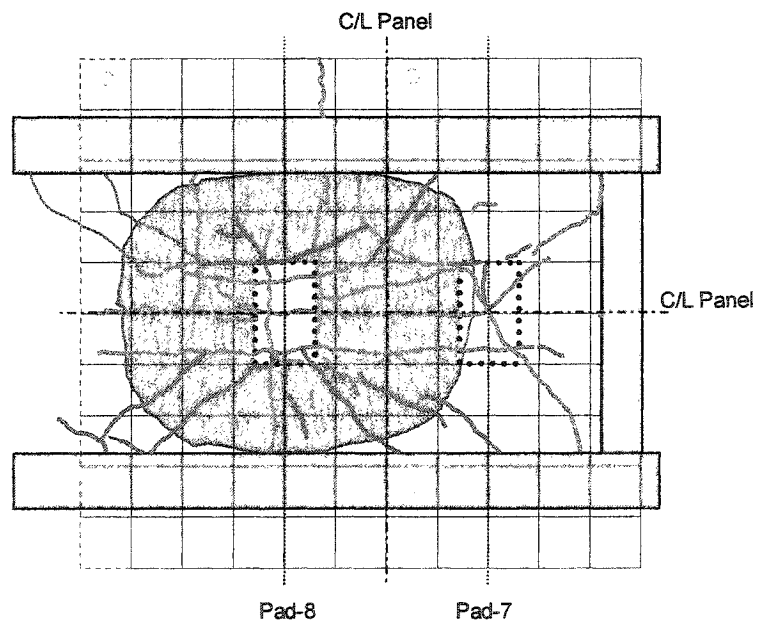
Panel-D: Crack Pattern on Soffit after Failure
